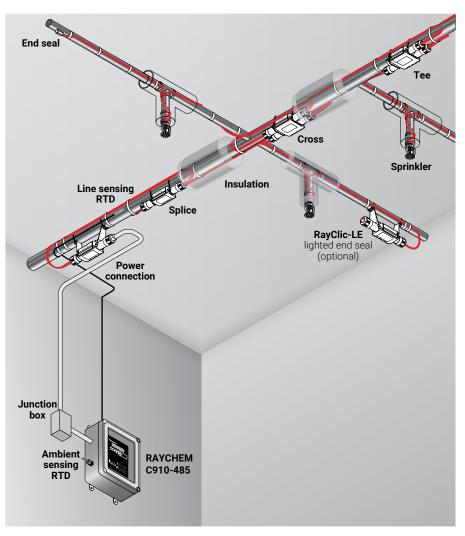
Typical fire suppression system for branch lines with sprinklers
